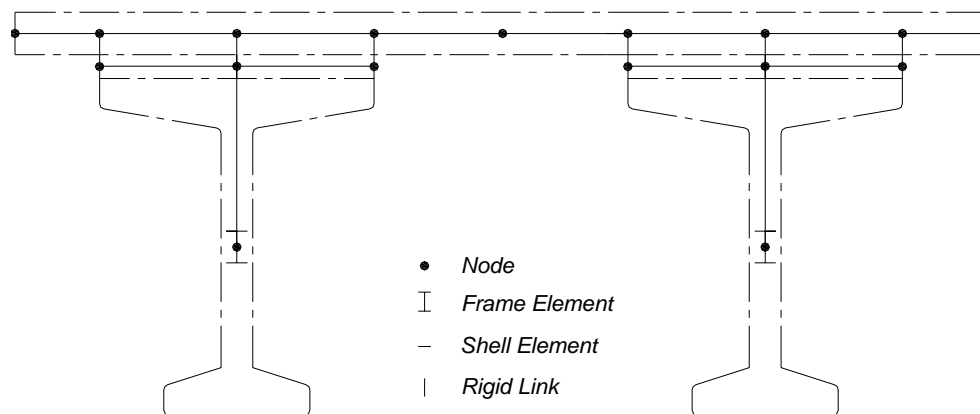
Cross section of finite element model for two girders (Barr et al. 2001).
